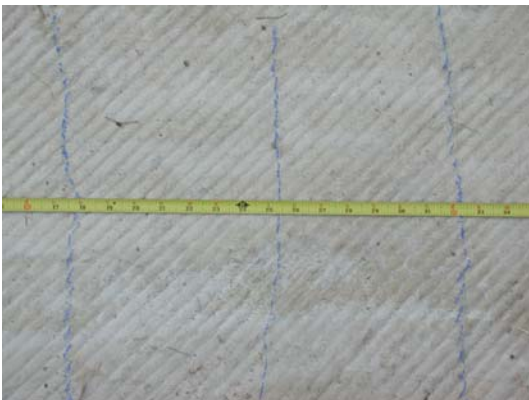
Cracking in ECC link slab (highlighted with blue chalk) with crack width 0.005 and spacing 8". (8 Days)
